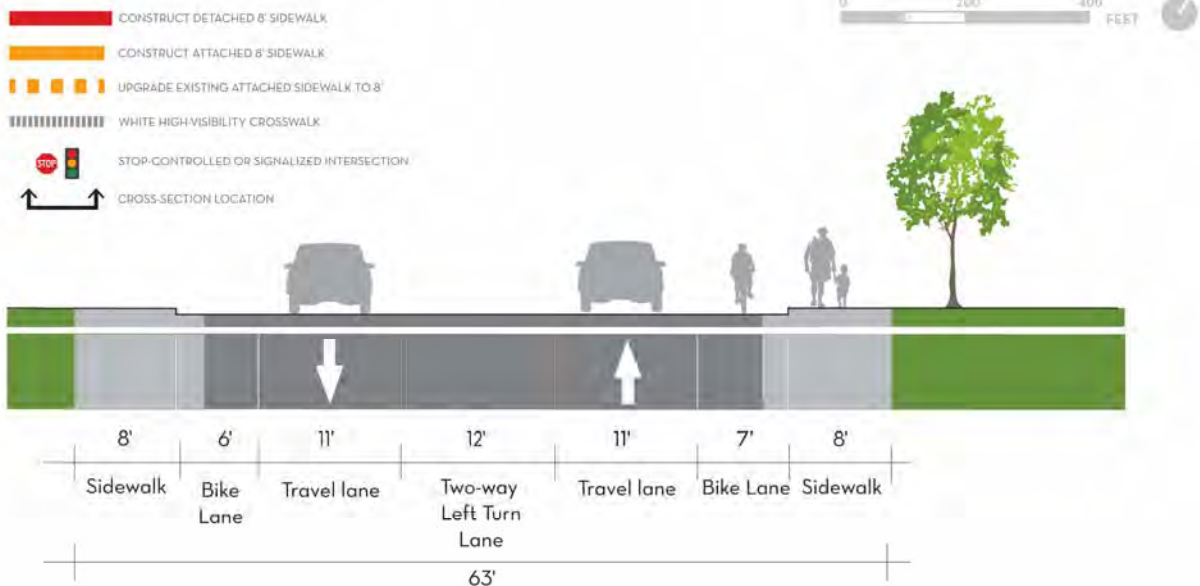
Old Auburn Road Focus Area Plan Sheet 1
